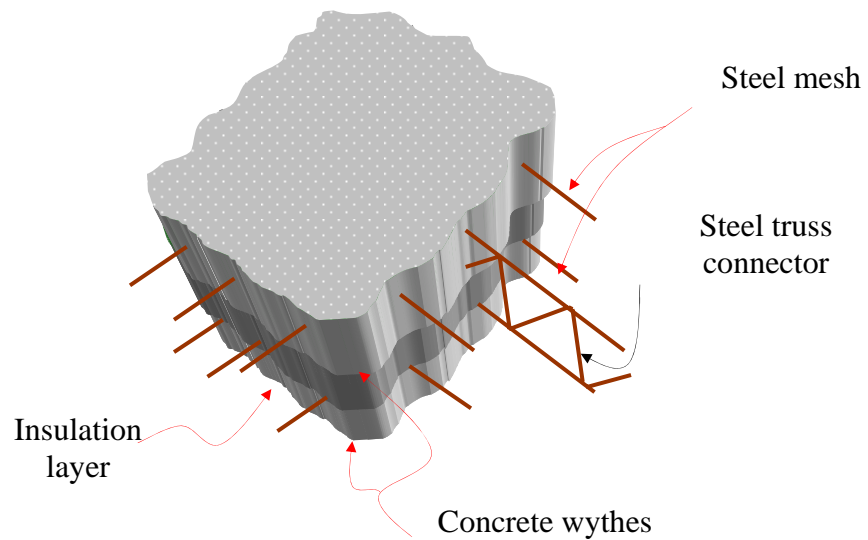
Precast Concrete Sandwich Panel in 3-D
